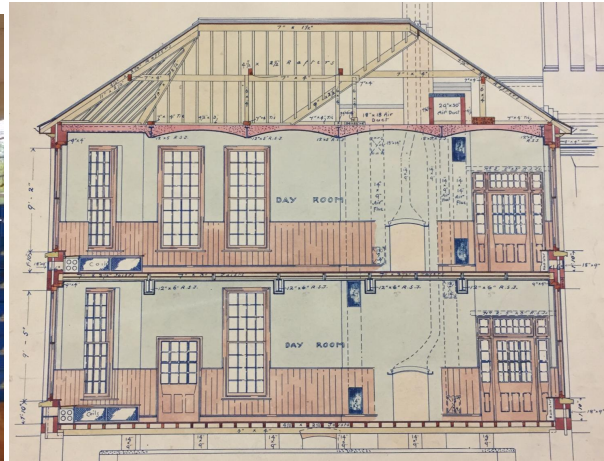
, Section drawing showing the adjacent image 16 (Skinner, 2019)
